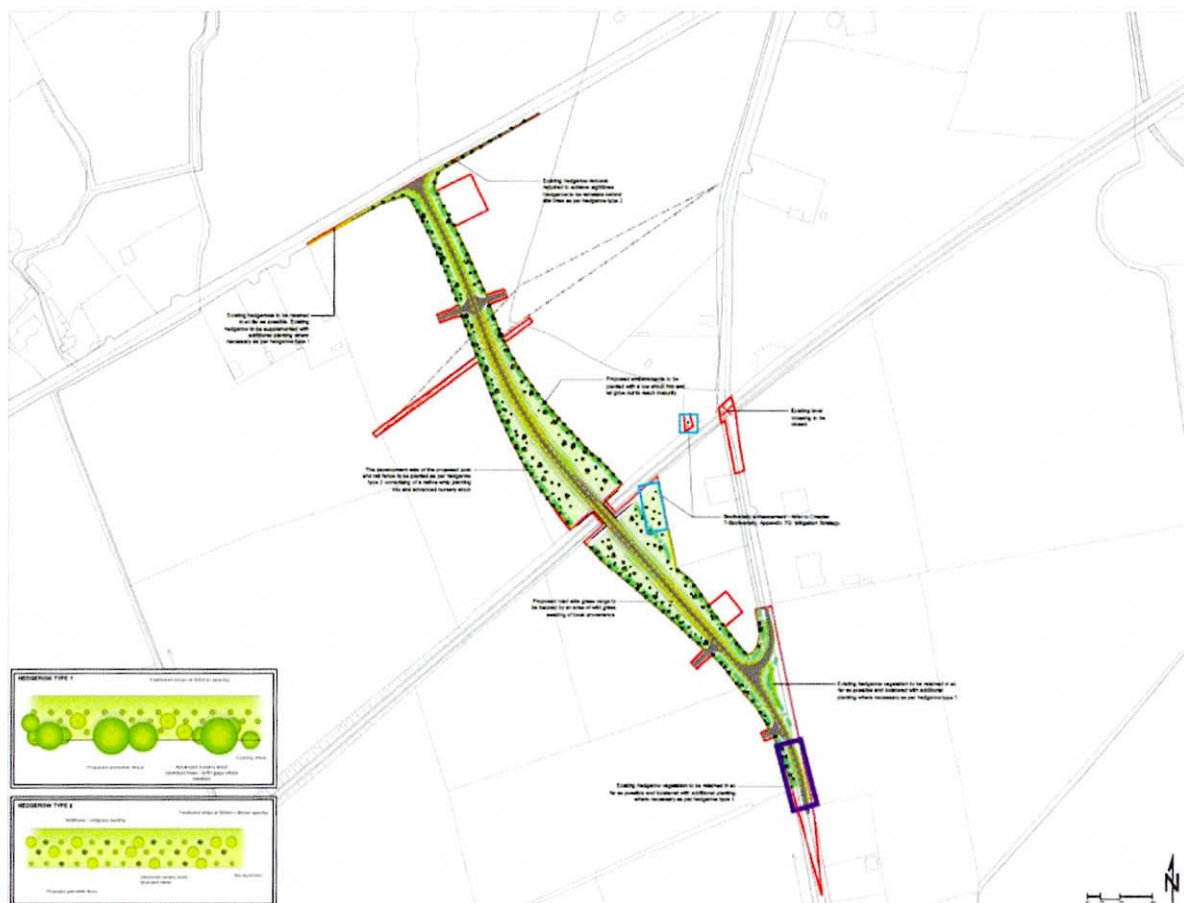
Proposed locations for four bird boxes at Thomastown. One area of scrub, along with one mature tree within Irish Rail owned lands (shown by blue boxes) are locations proposed for bird box installation. The purple box shows the location of one large mature tree which will be lost.
